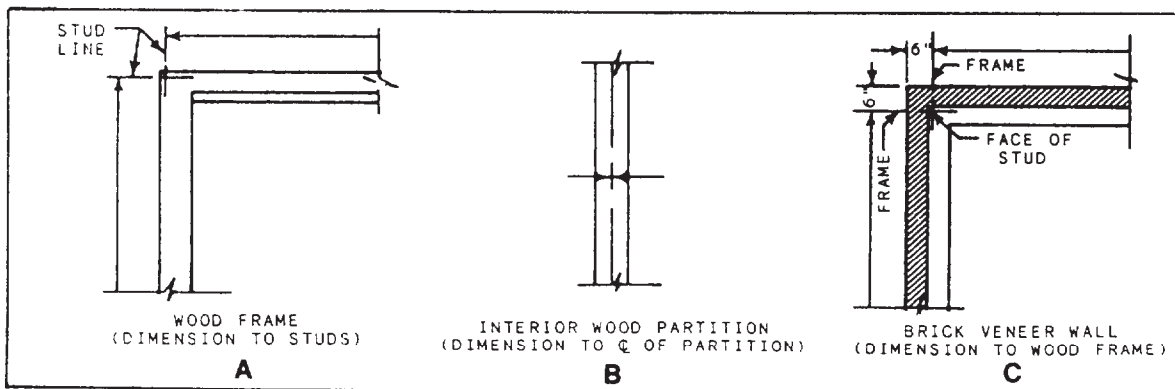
Dimensioning wood-frame and veneer construction.
